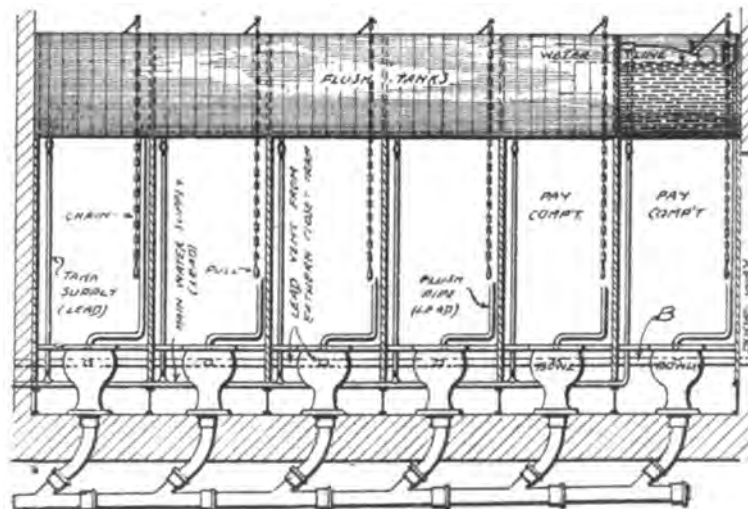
Elevation of Water Closet Compartments, Showing Ancient Flushing Arrangement, Grand Trunk Station
